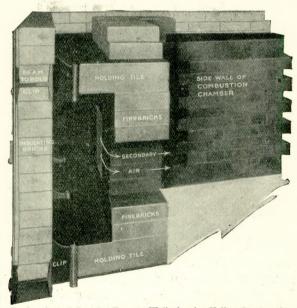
Section through Lopulco Furnace Wall, showing Hollow Construction and the Supports for Holding Tiles to allow for Vertical Movement when the Wall Expands and Contracts.
